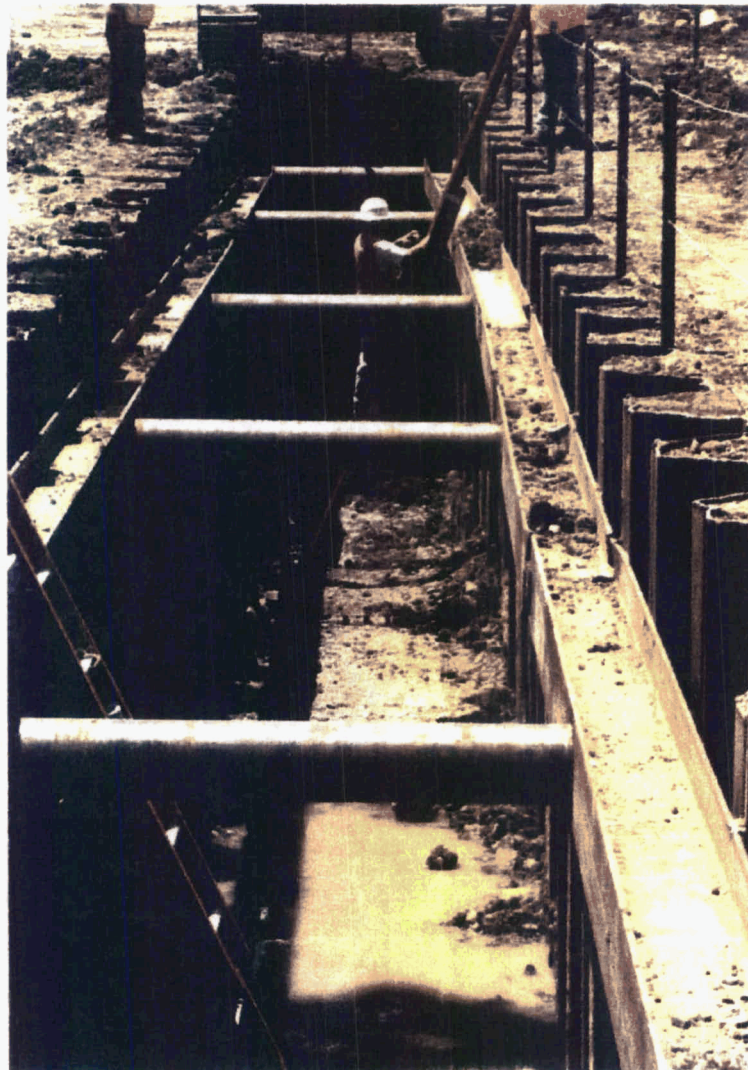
Sheet Pile Box With Structural beams and Cross bracing in Place
